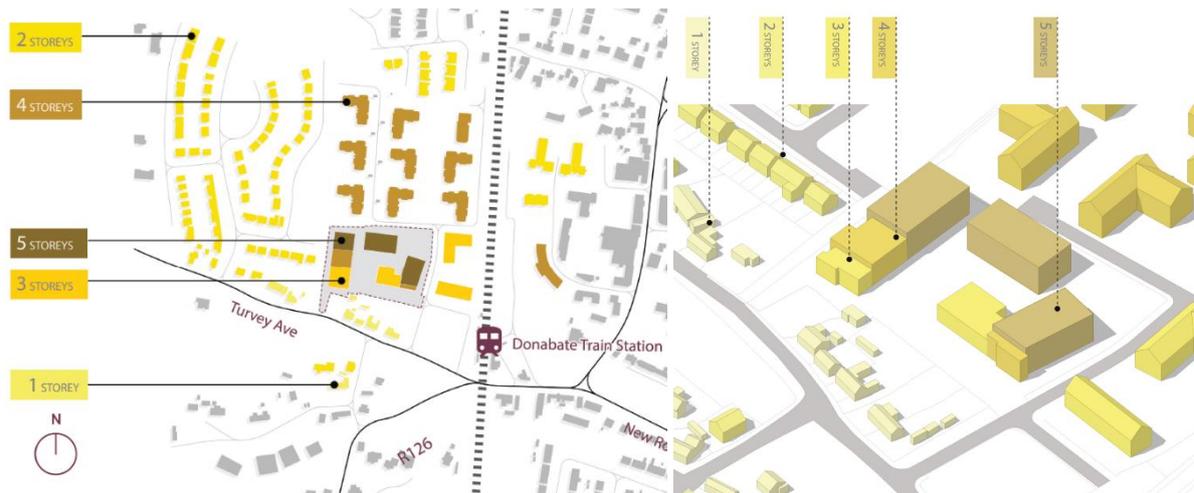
Building Heights (proposed development and existing and permitted built environment)
